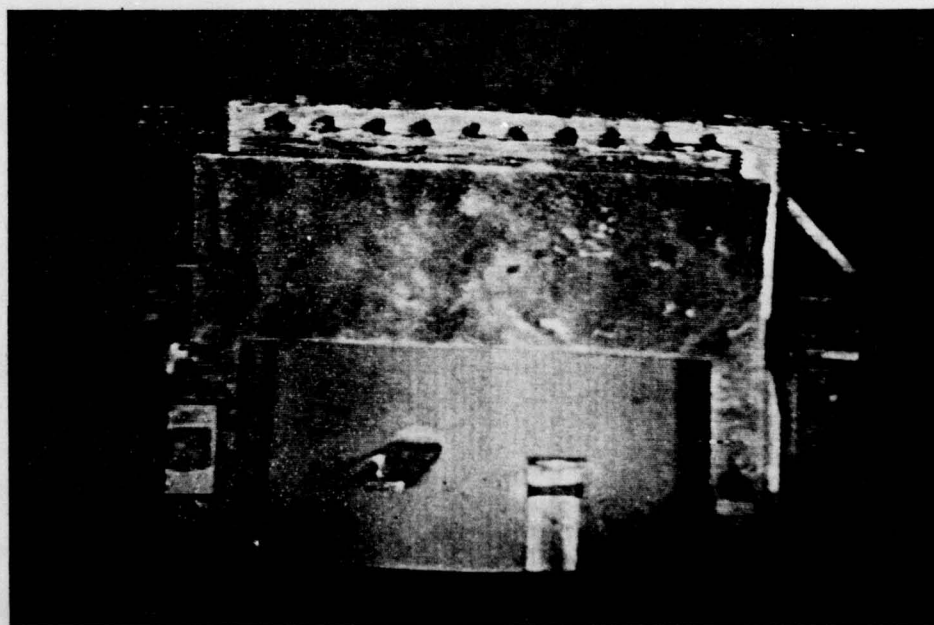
Towers on wet sand, after foundation failure,
